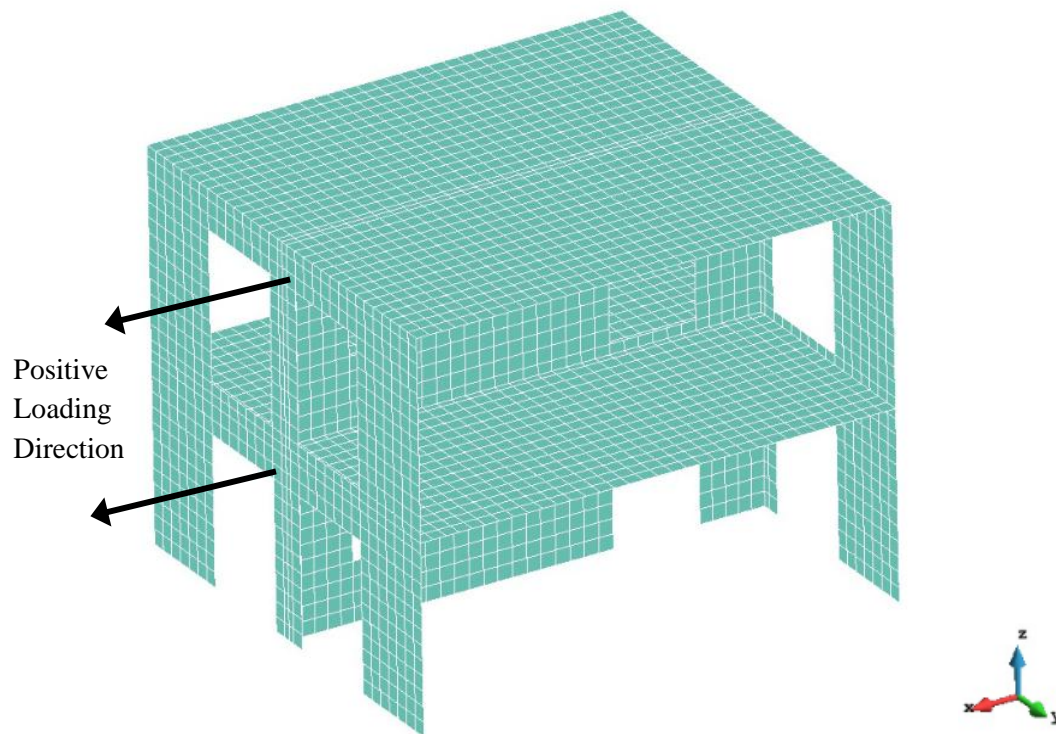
Finite Element Model of Two-story Reinforced Masonry Wall-Slab Building System
